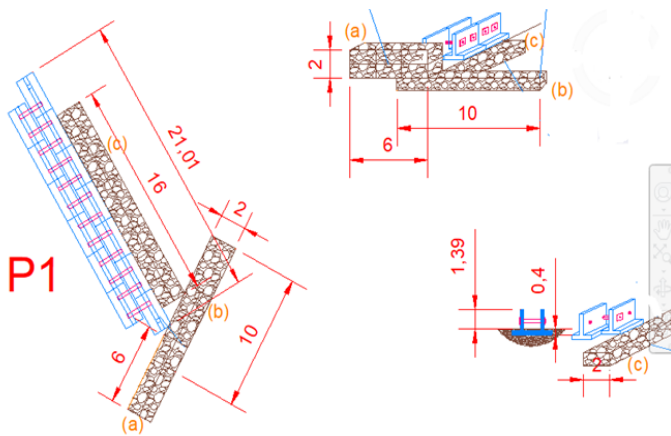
Plan Details - Foot Erosion Protection – Source: YPF SA
